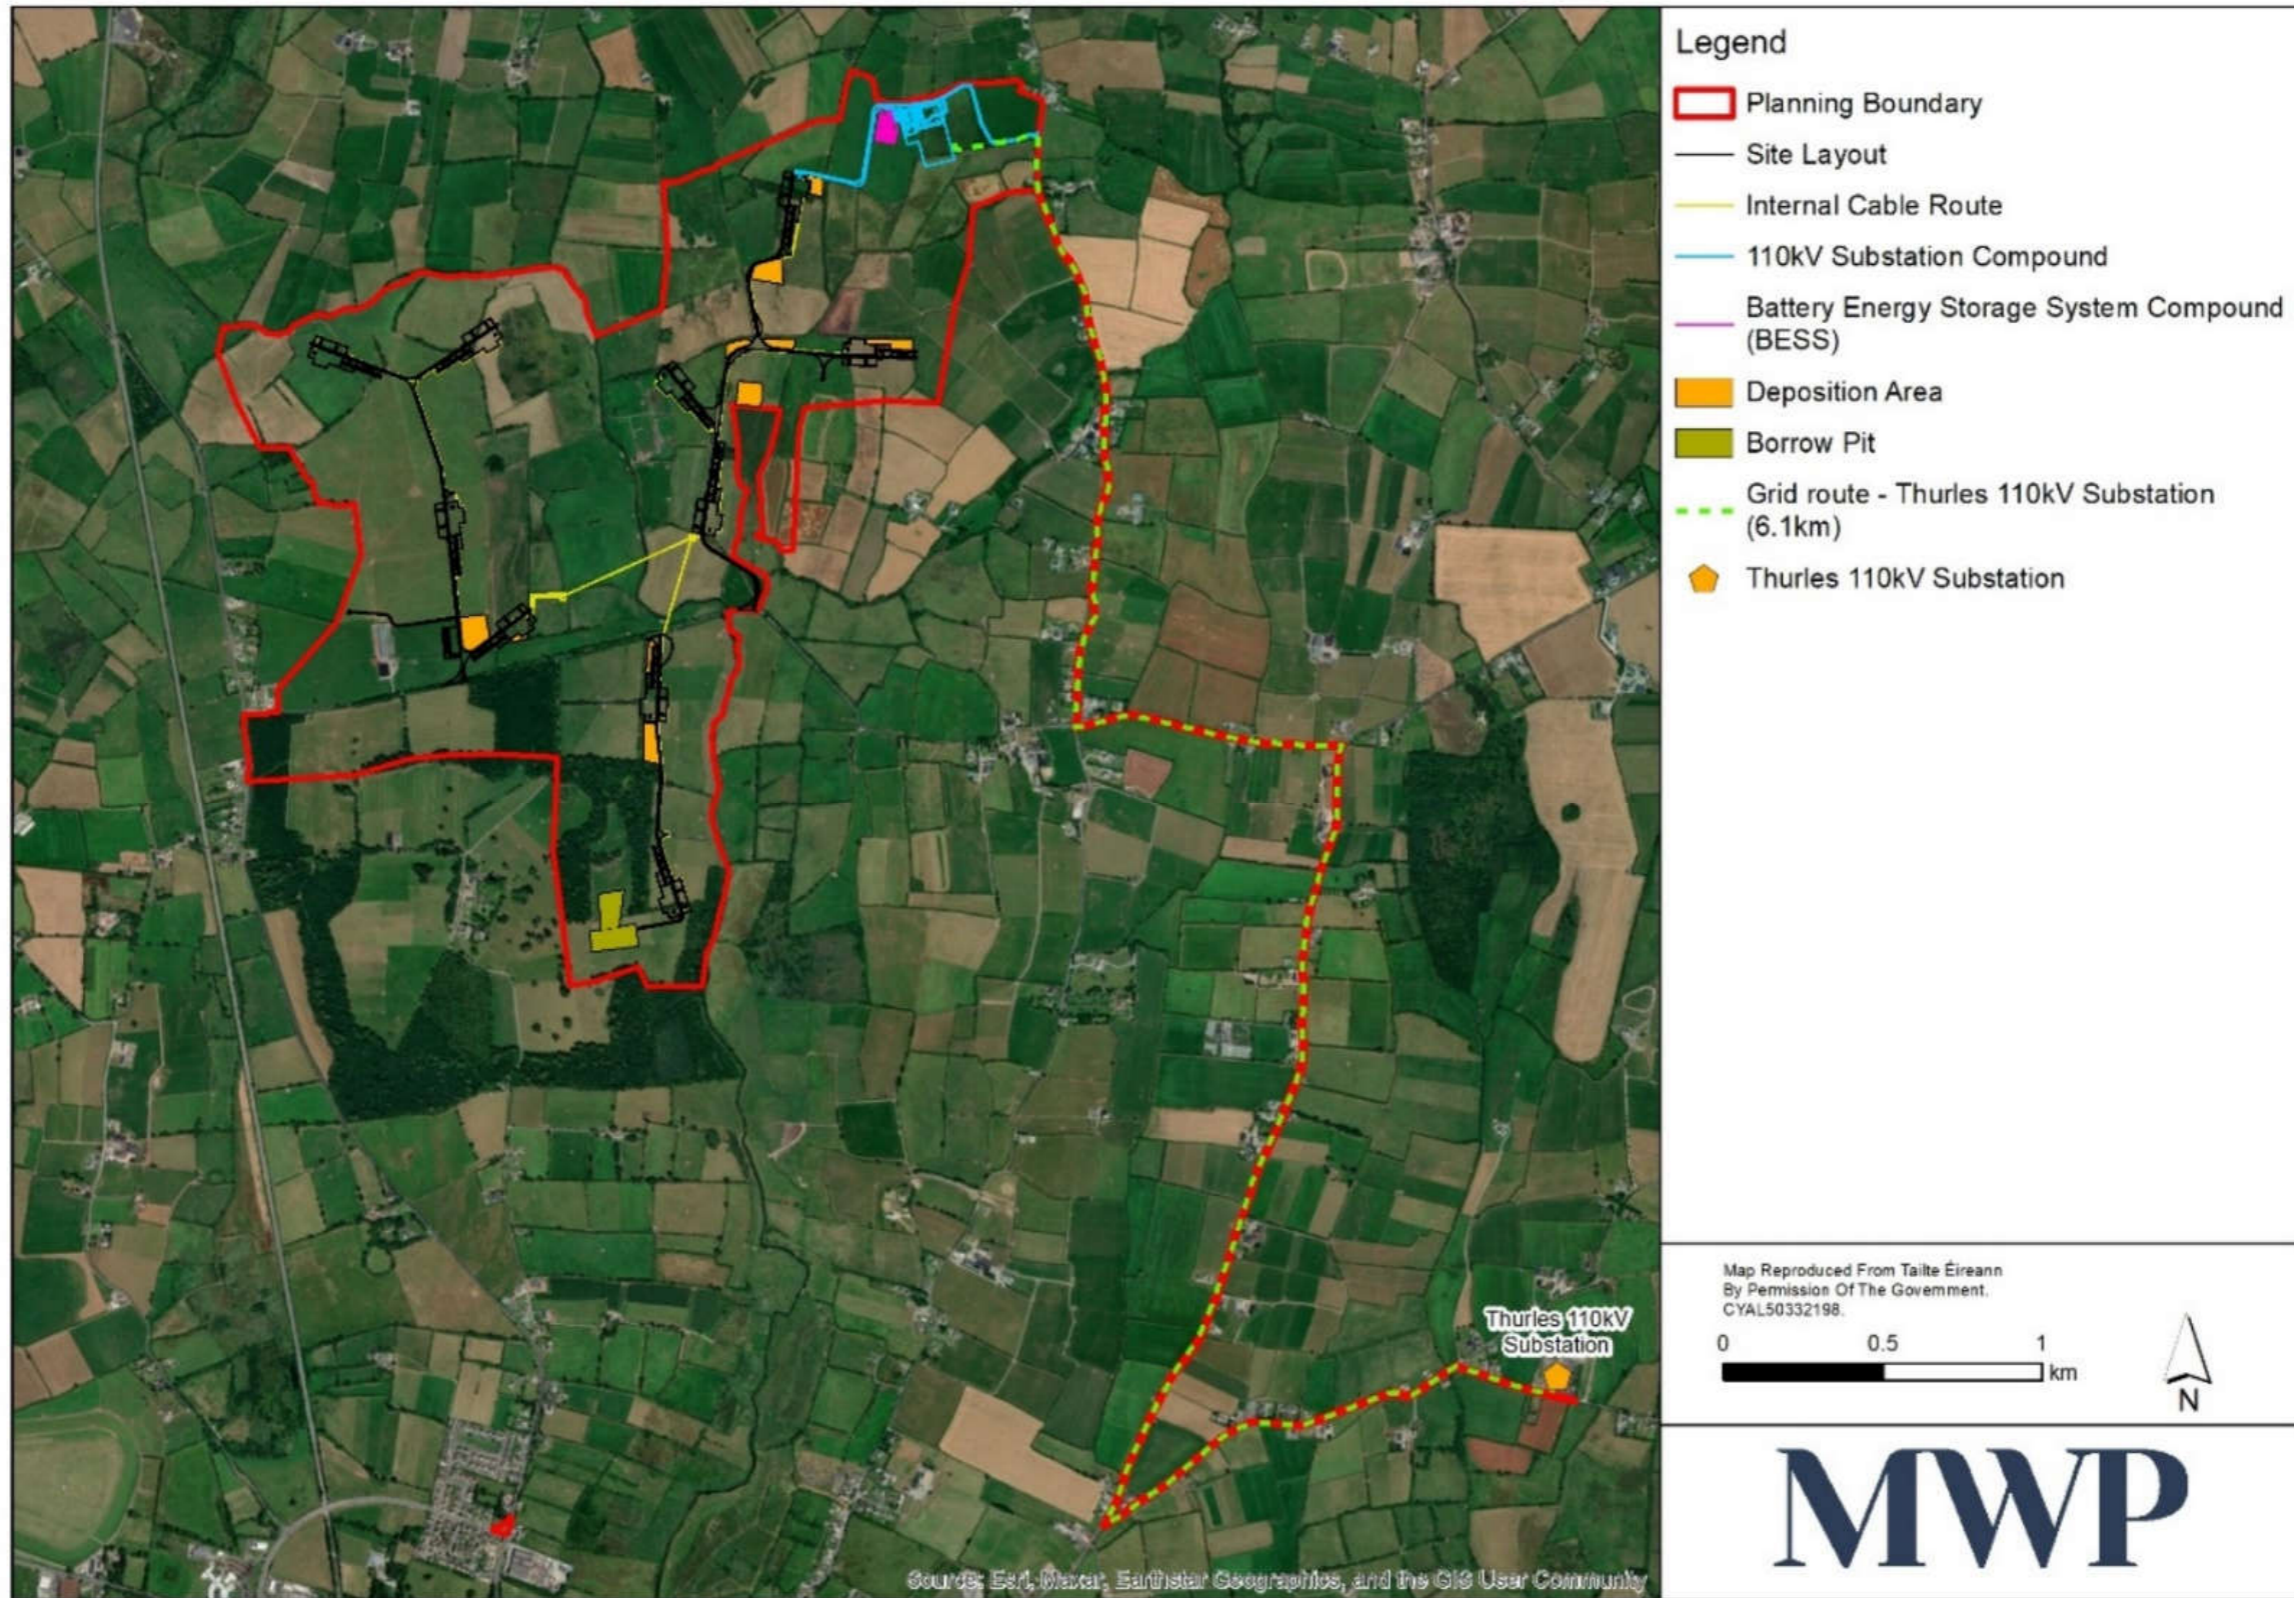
Proposed layout of Wind Farm Infrastructure within the Planning Application Boundary
